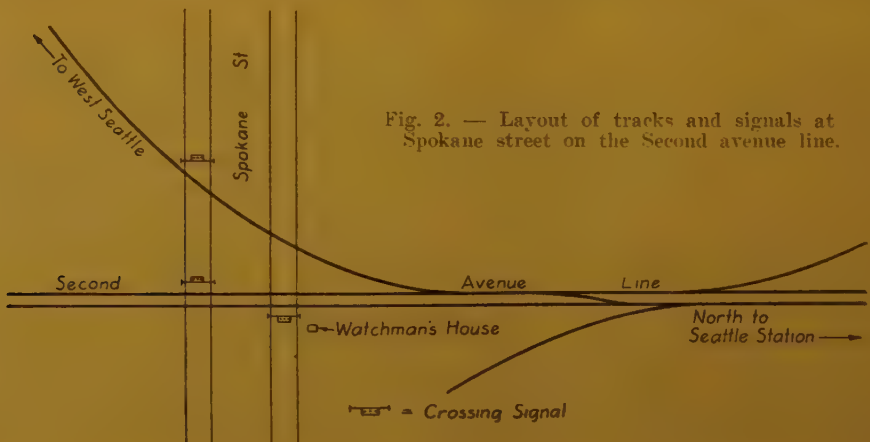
Layout of tracks and signals at Spokane street on the Second avenue line.
